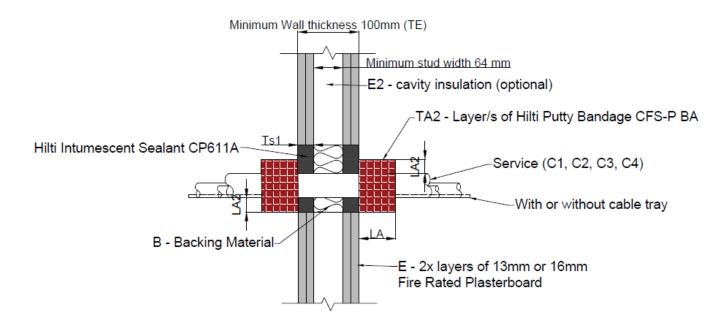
AS 1530.4:2014 D1 Standard Cable Sets Seal Type 5, Side View, Refer to table 8
